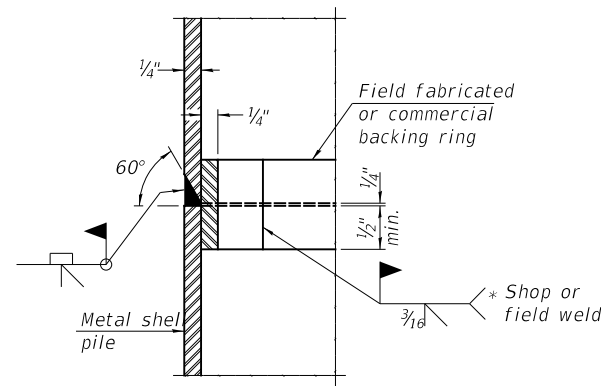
DETAIL OF METAL SHELL PILE ENCASEMENT AT ABUTMENTS
